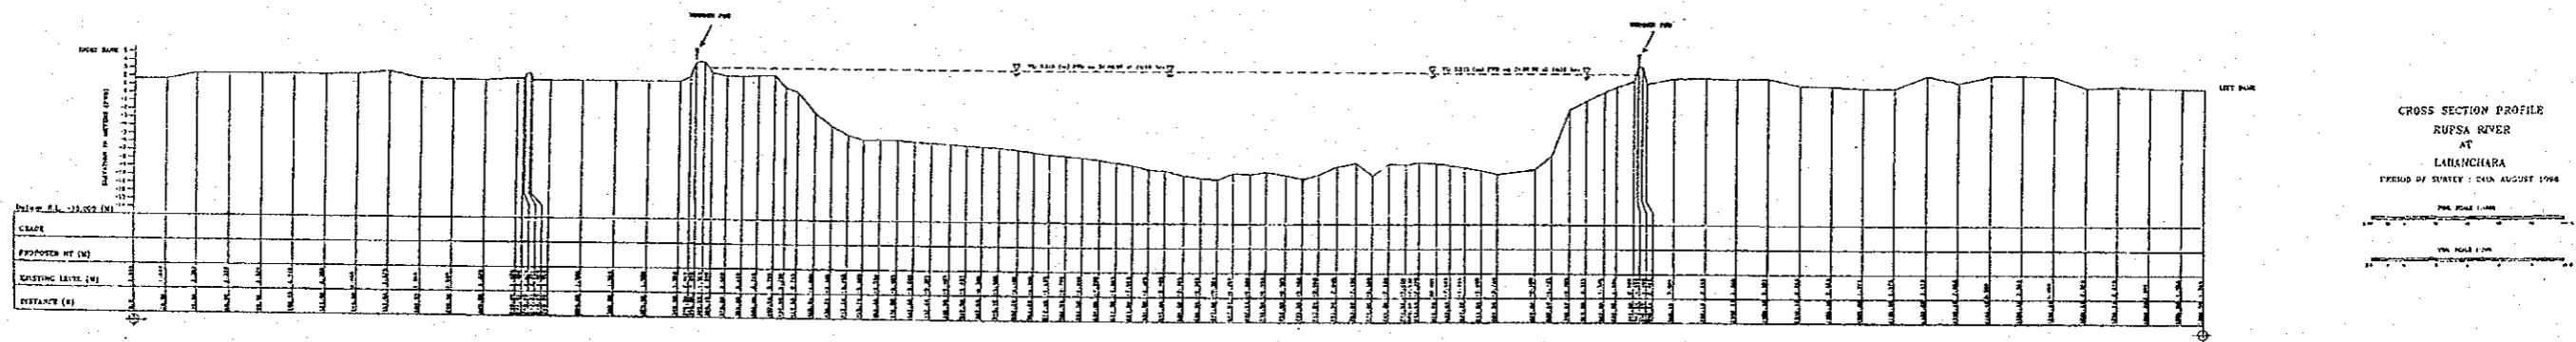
River Cross Section (1) Rupsa Bridge
